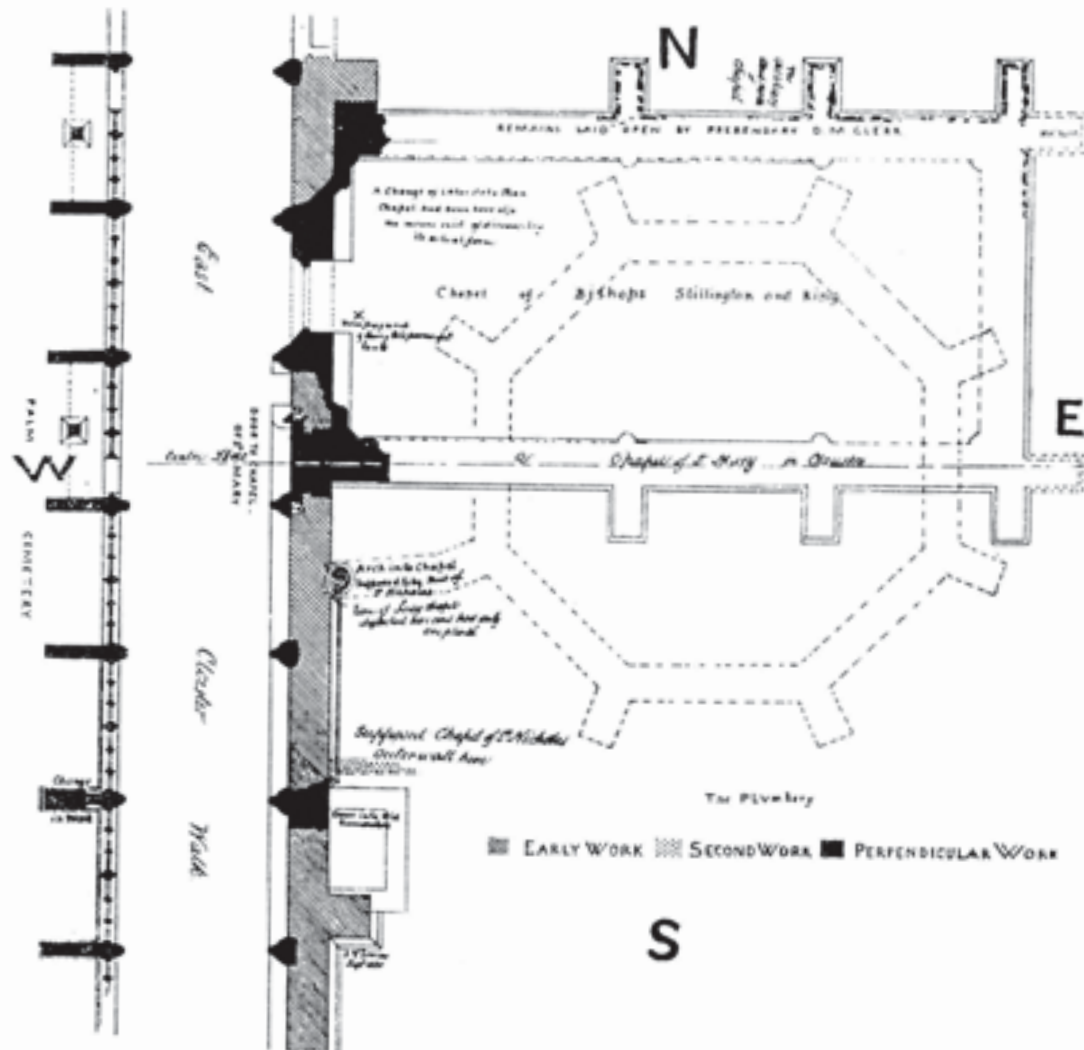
James Irvine's plan (1885) of the supposed octagonal building adjoining the east cloister, based on keyhole excavations in 1851 and 1873(?). At first thought to be the site of an early chapter house, the building was subsequently interpreted as a chapel; later excavations proved its outline to be entirely spurious. After Church 1888
